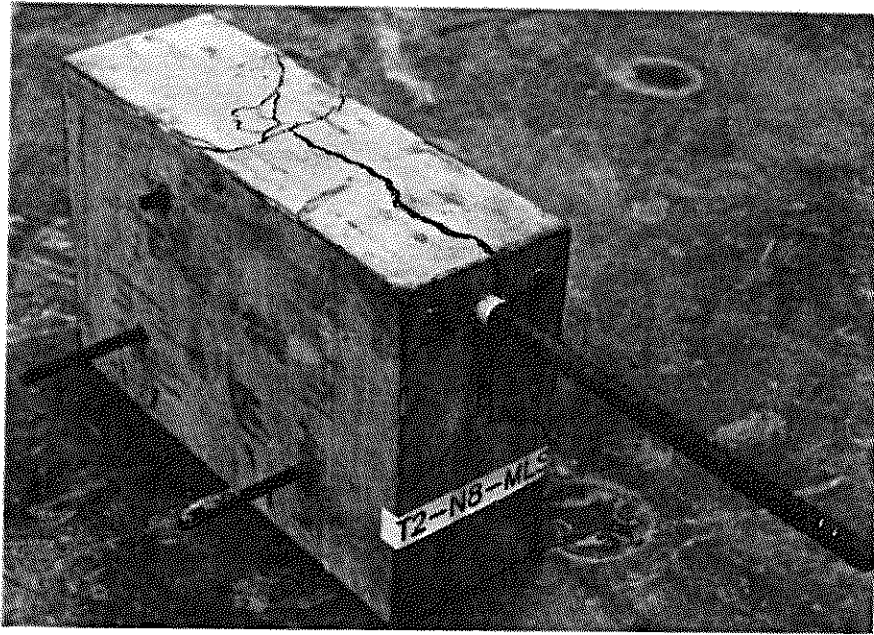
Beam-end test specimen without transverse stirrups after failure. Cracks on the front face of specimen form an inverted Y with vertical crack passing through the location of the test bar
